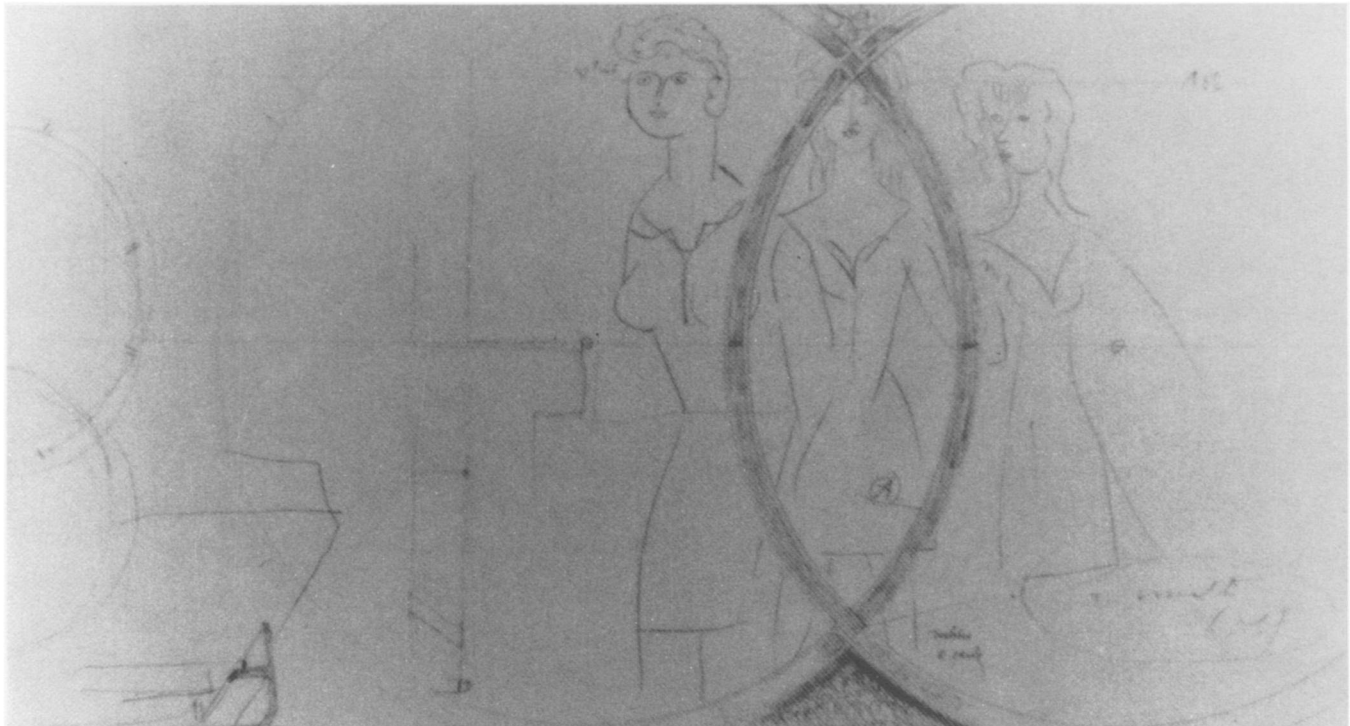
Carlo Scarpa. Sketch for the crossed ring window. Entry, Brion Cemetery, Elevation.
